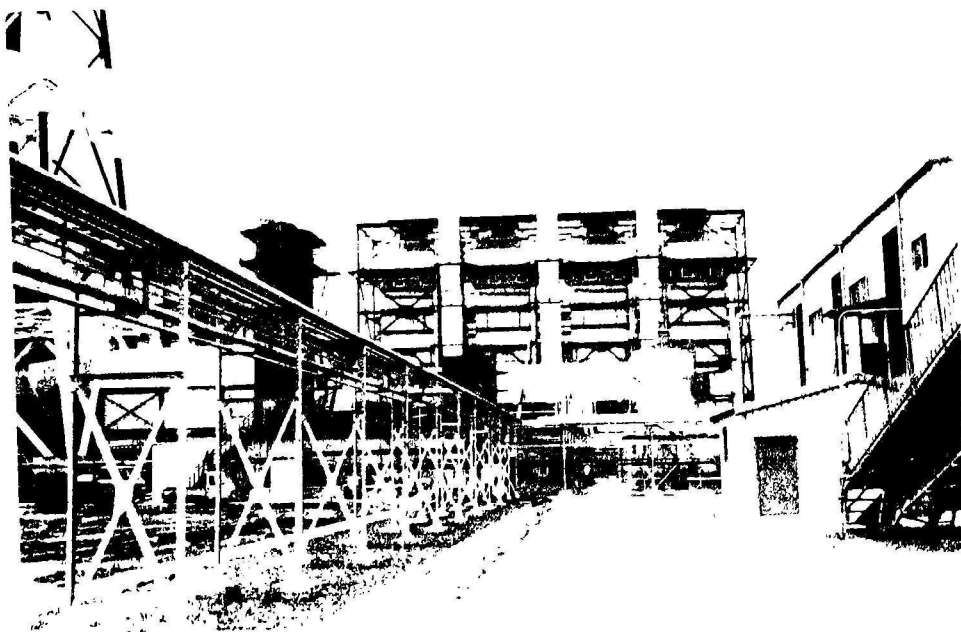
Tamashima Plant, Chugoku Electric (500 MW)
